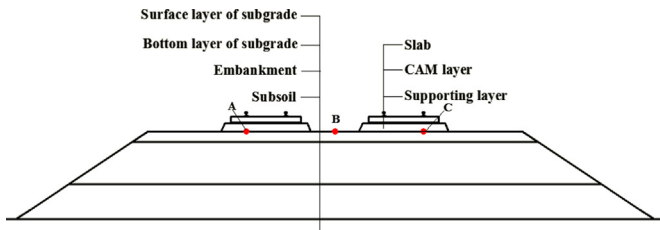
Cross section of the Beijing-Shanghai double-line low-embankment high-speed ballastless slab track railway.
